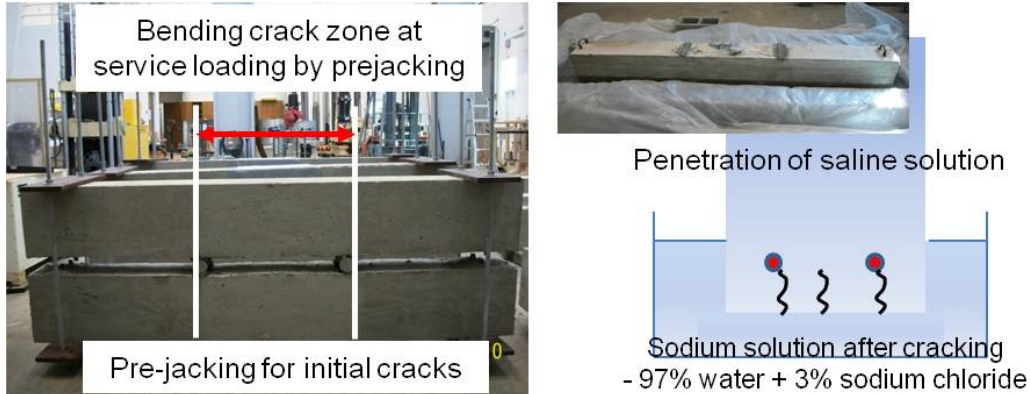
Pre-jacking for initial cracks and immersion in 3% saline solution after creating cracks simulating damages under service loading level
